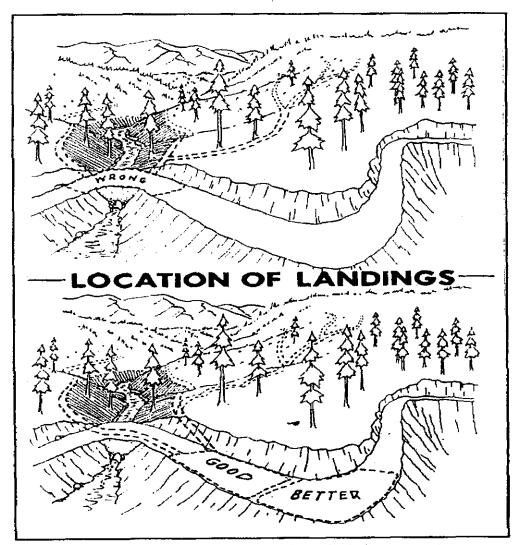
Log landings on forest road systems should be kept to the absolute minimum size necessary to accommodate yarding, loading and hauling equipment and the minimum number needed to remove timber resources. Landings constructed on gentle ground and broad ridge crests far removed from stream channels are least likely to cause water quality problems, whereas landings built on steep slopes and near watercourses can result in severe impacts. From Weaver and Hagans (1994). Adapted from (USFS, 1963).
